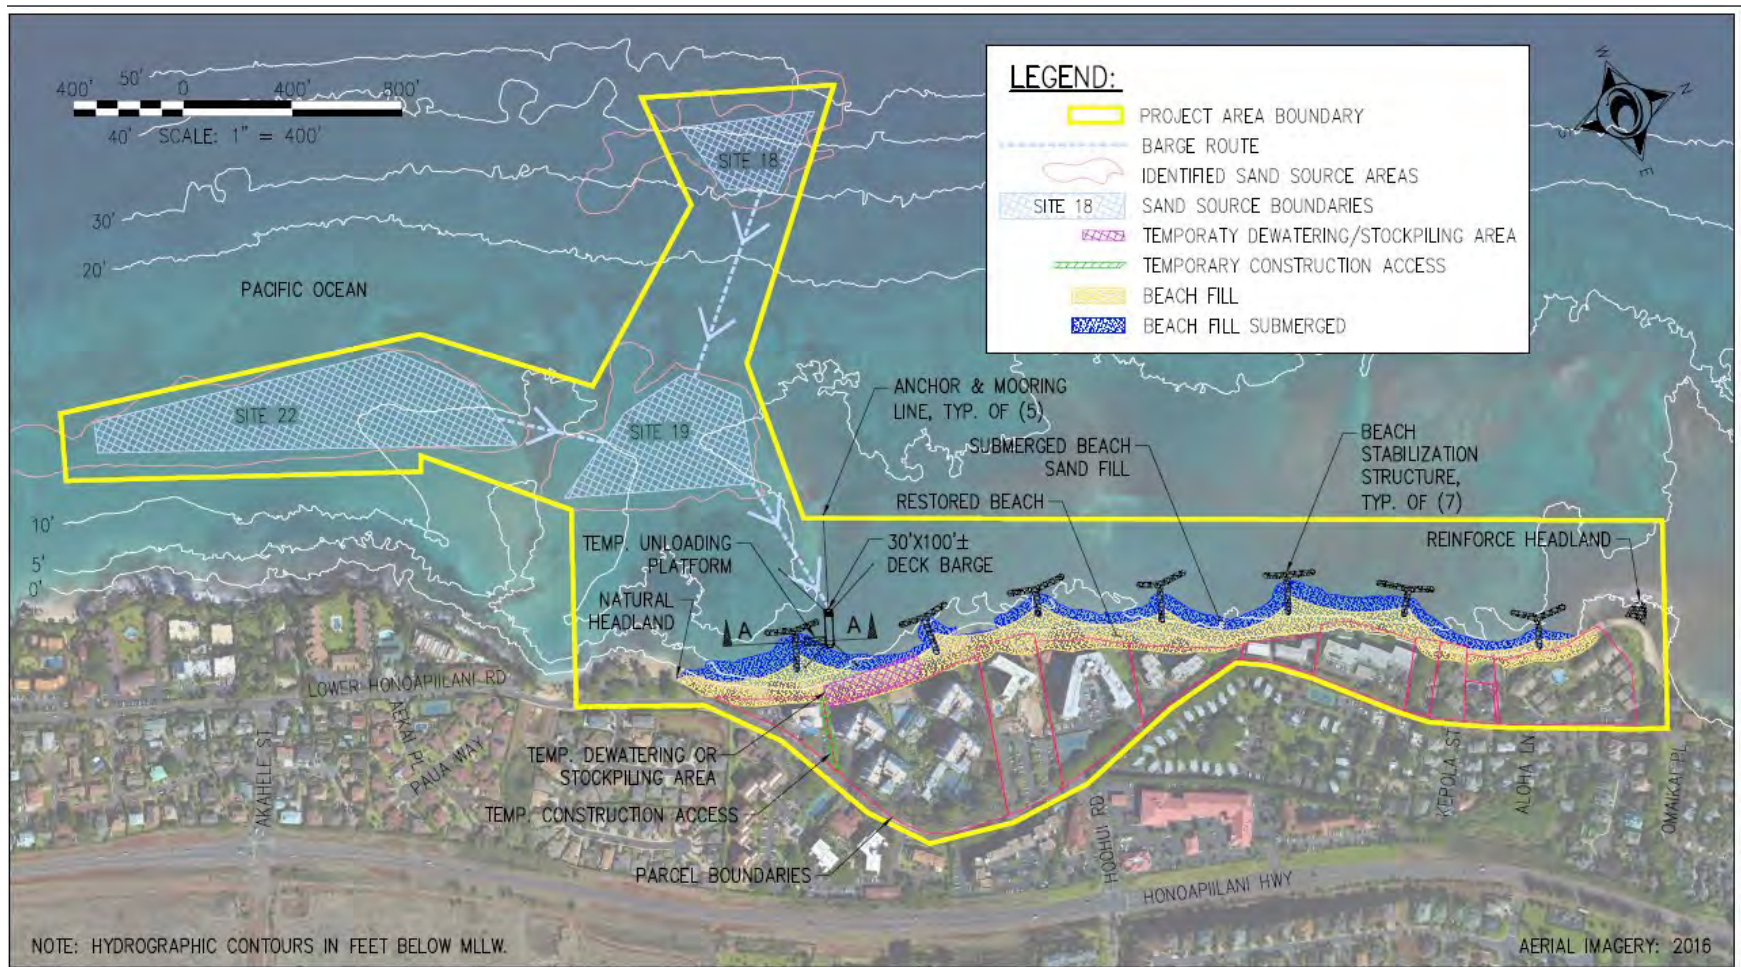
Proposed Construction Methods – Barge Route for Mechanical Dredging
